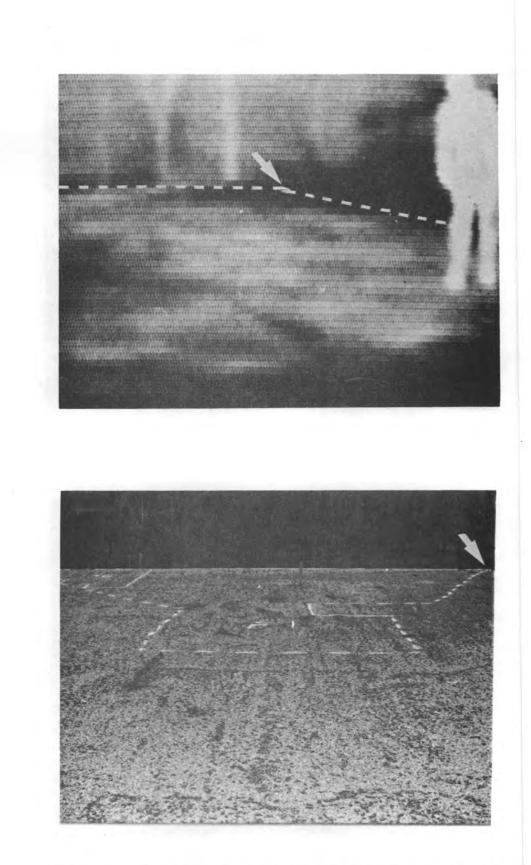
1975 thermogram and 1977 photograph of wet area in northeast corner of roof, Building 120 (arrow points to the corner of roof).
